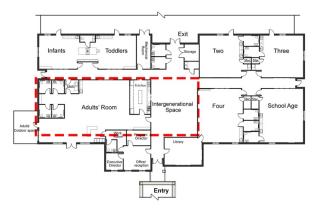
Floor plan of Generations Crossing- by Mather Architecture
